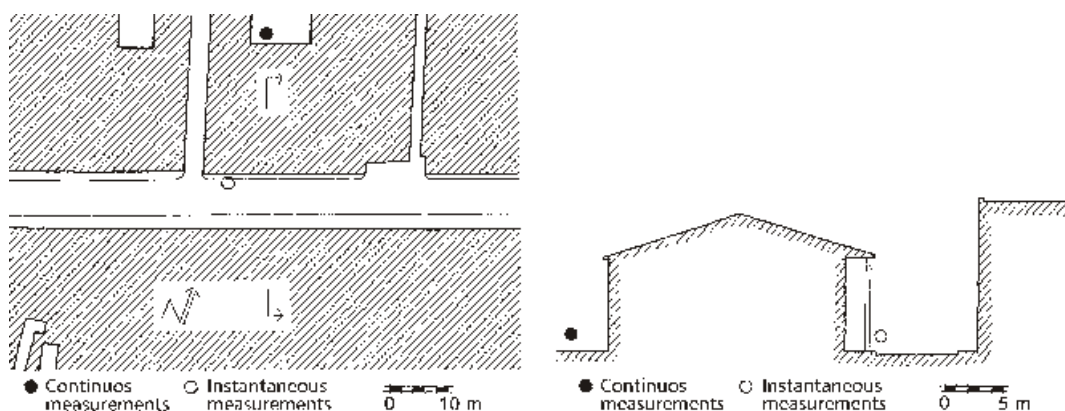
Plan and section of the Prince Street (Dutch-period Museum) site in Pettah (DMP) showing the position of the measurement equipment.
